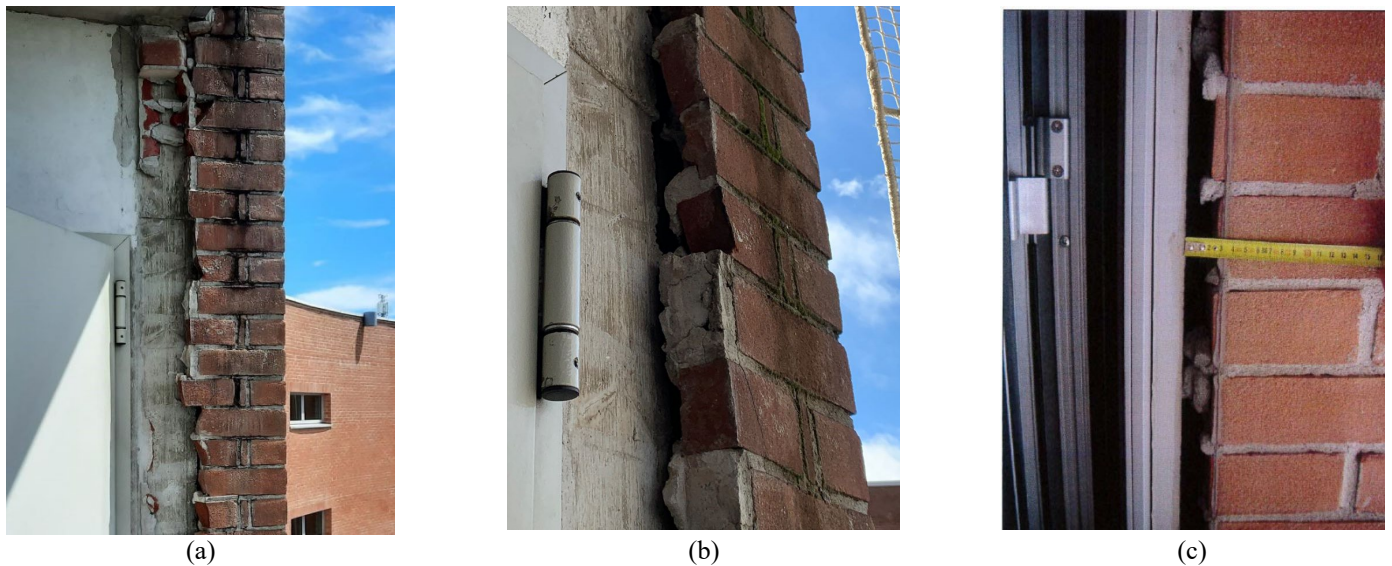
Damages on the brick masonry veneer walls: (a) cracks and relative displacements, (b) detachment of the adhered masonry walls and localized brickwork collapses and (c) detachment from the backing structure along one vertical edge of a window.
